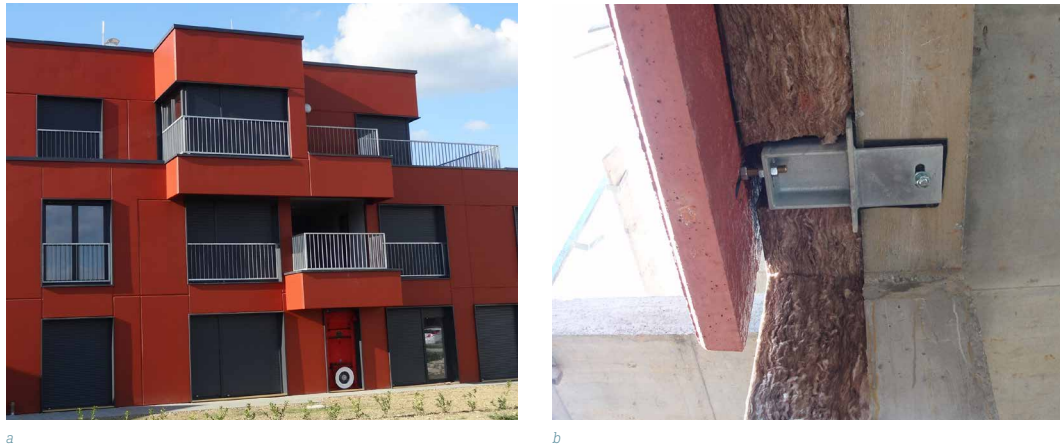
“First ECO-SANDWICH® house”: a) south façade; b) thermal break for anchoring systems
